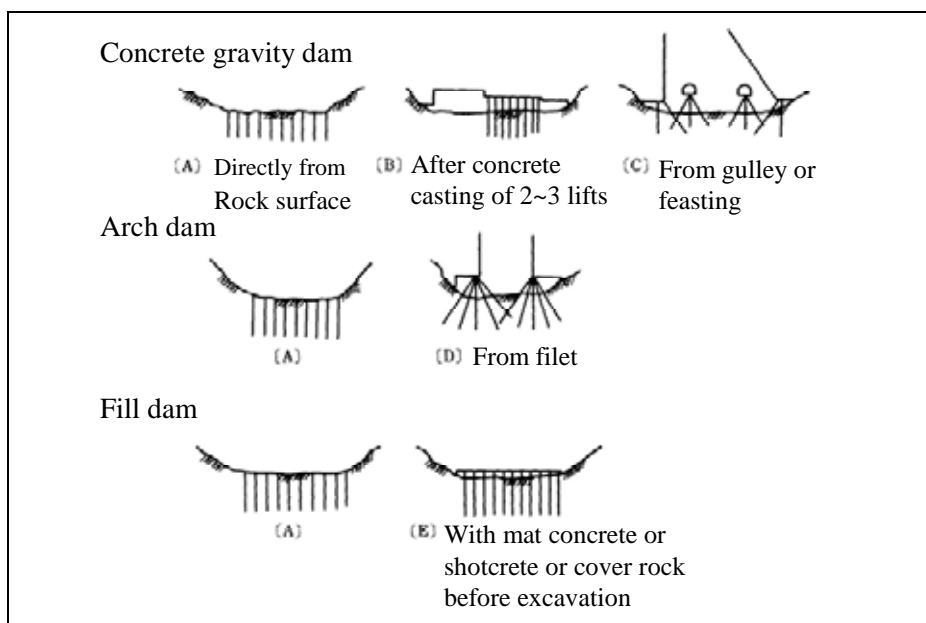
Arrangements of Consolidation Grouting (1)
